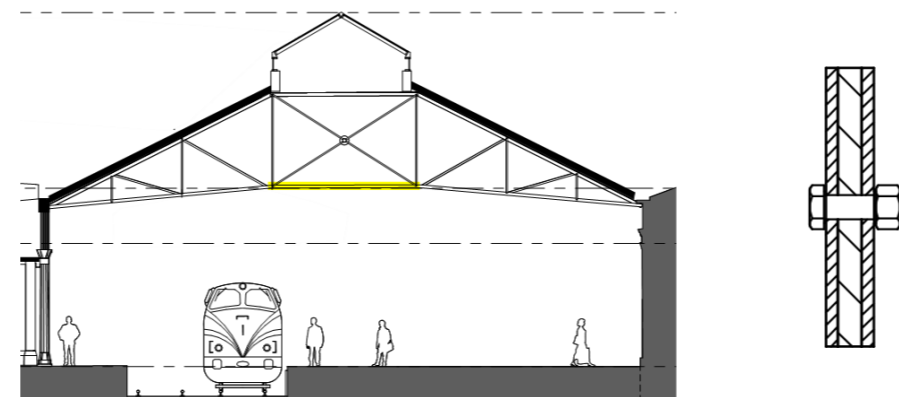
Strengthening detail to bottom boom of 6No. trusses at Manchester end of Roof A
